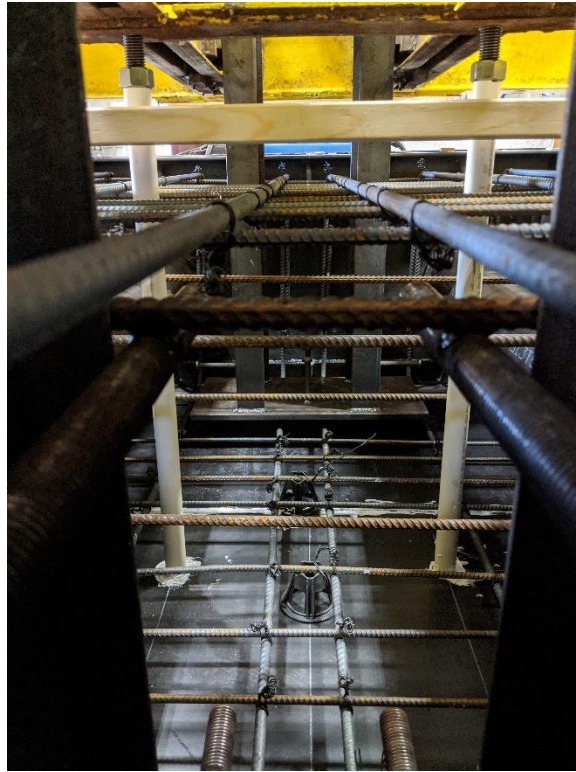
Embedded steel positioned inside the concrete block formwork
